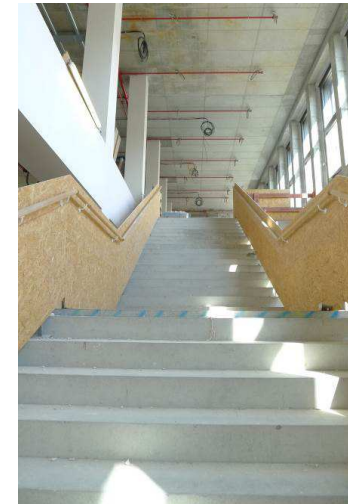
View into the staircase hall, construction site, Photo BBR, July 2017
